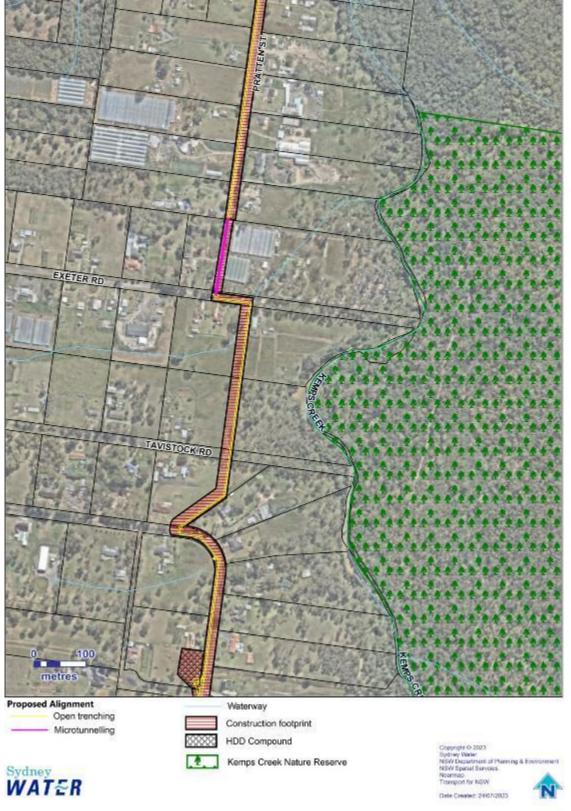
Construction footprint – southern section (adjacent Kemps Creek Nature Reserve)
